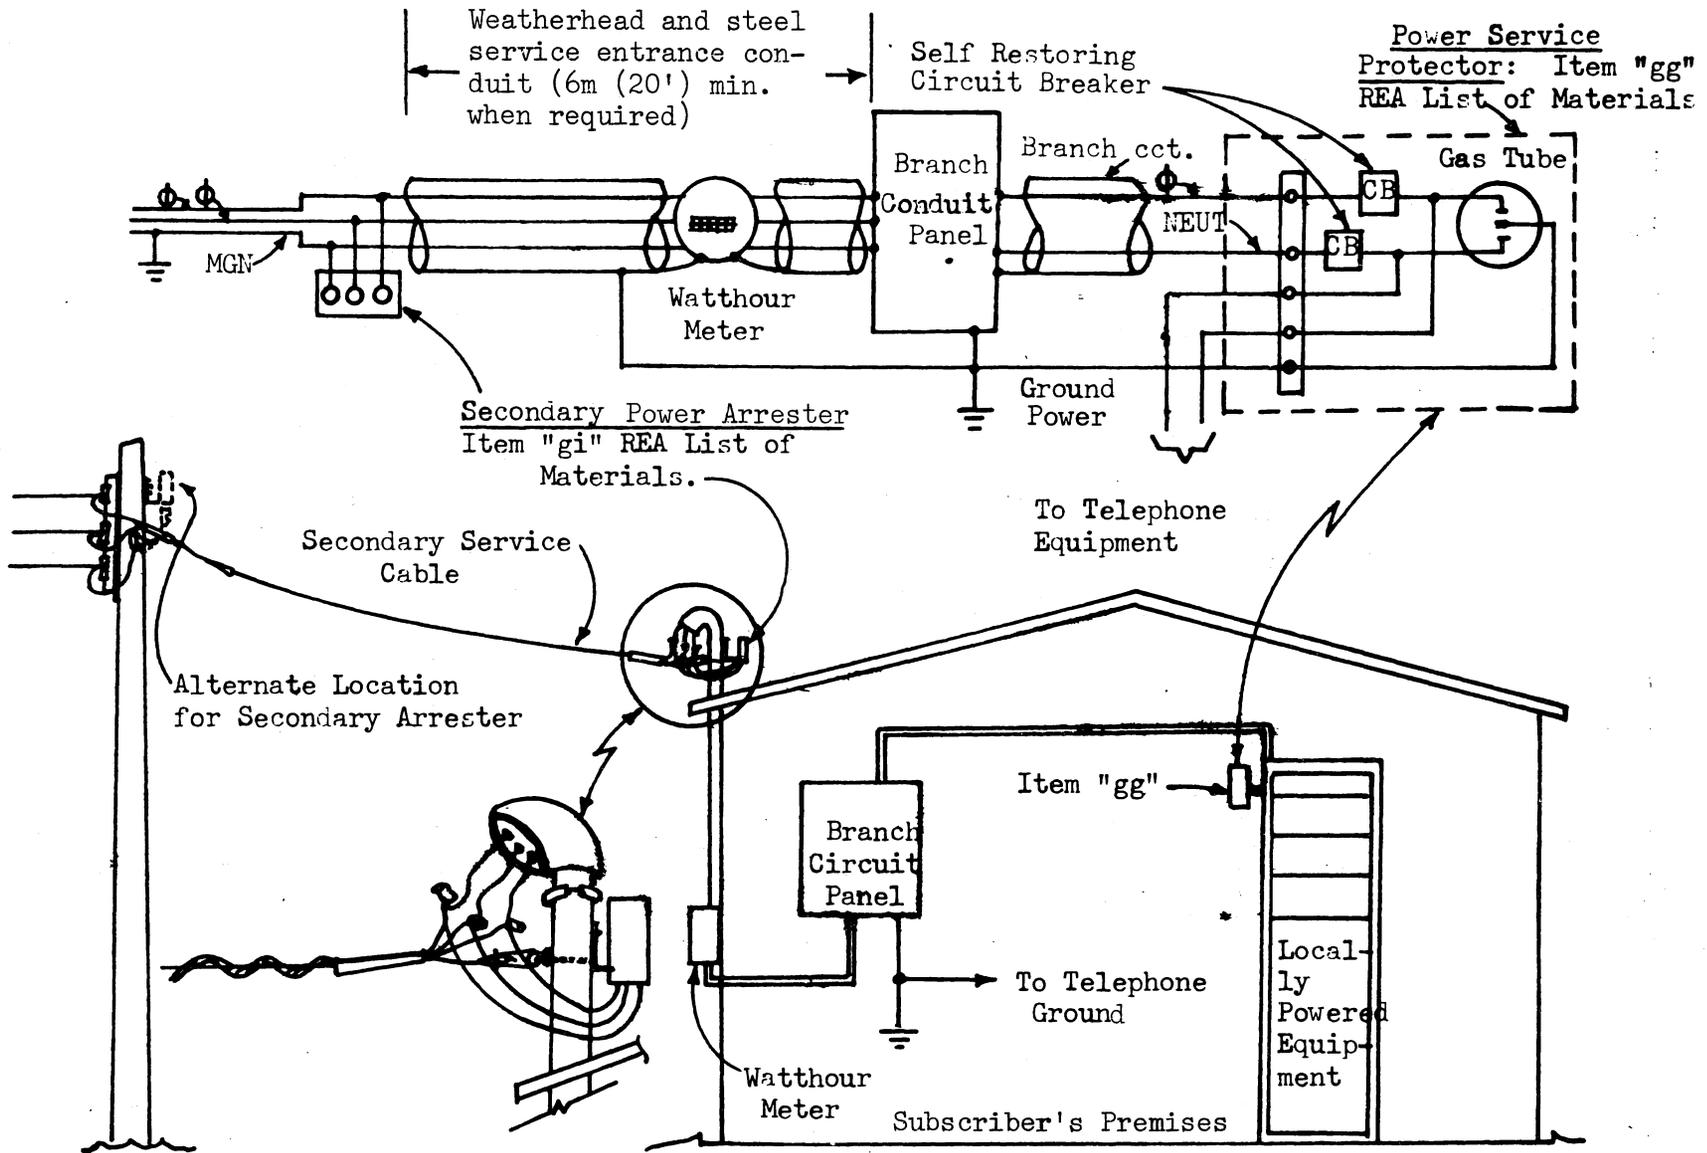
TYPICAL INSTALLATION OF SECONDARY ARRESTER AND BRANCH CONDUIT POWER SERVICE PROTECTOR
